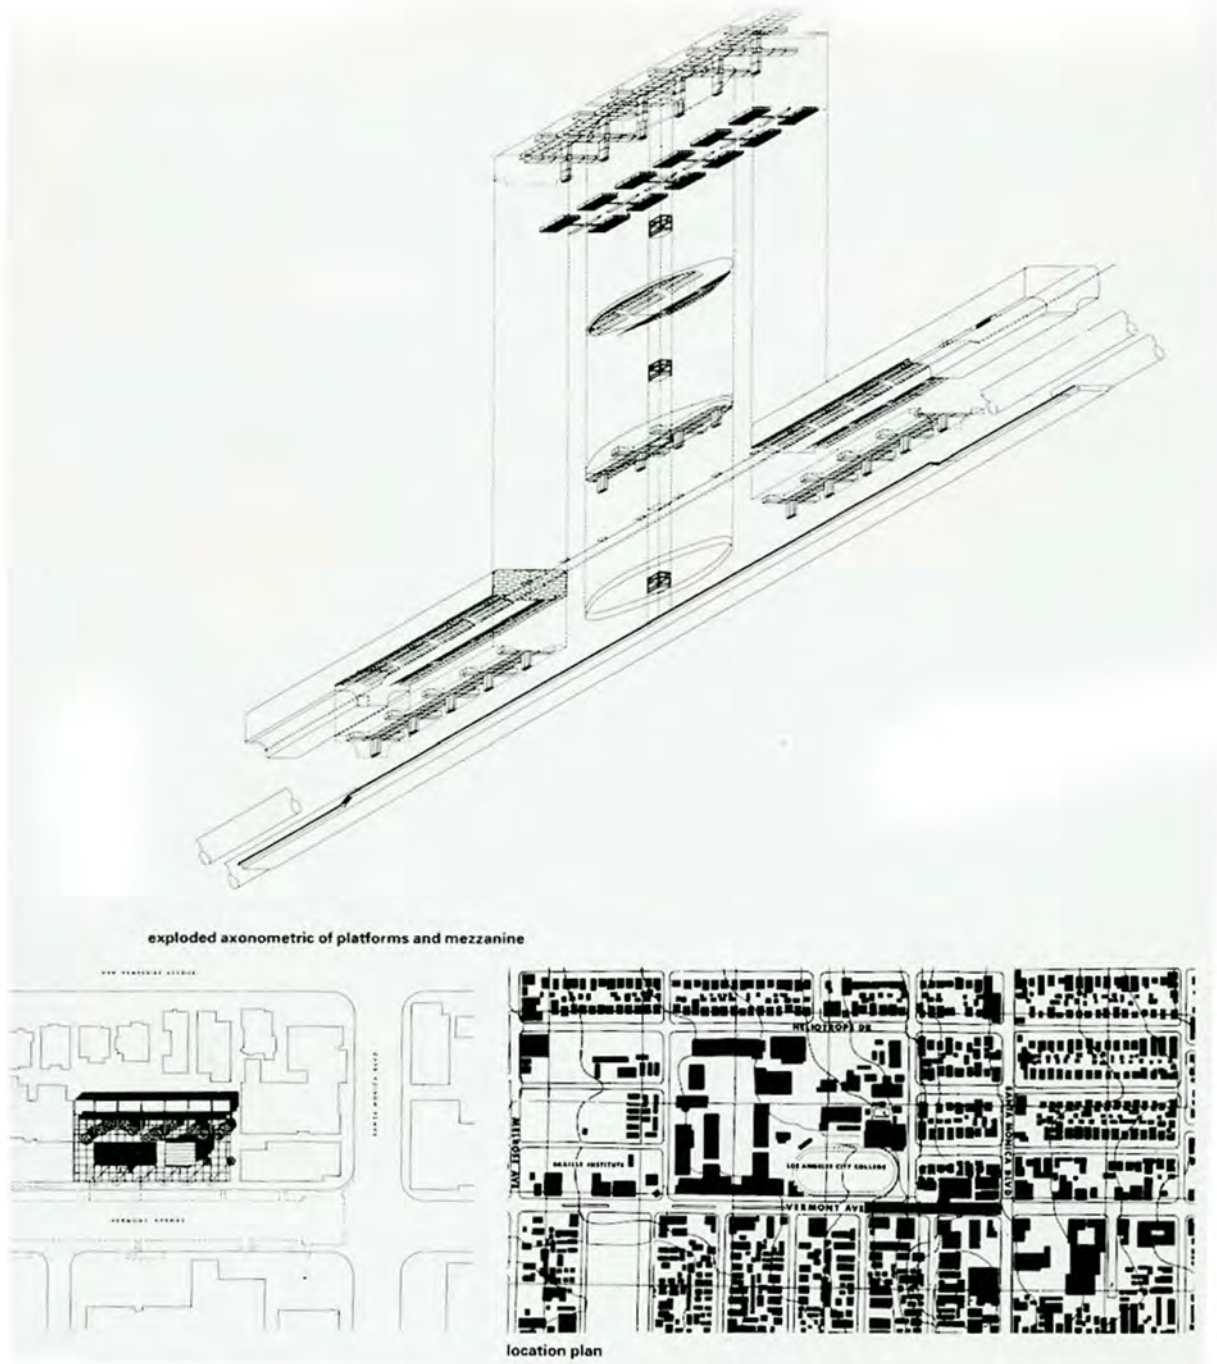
Drawings from bottom: location plan, Exploded Axonometric (un-referenced)
